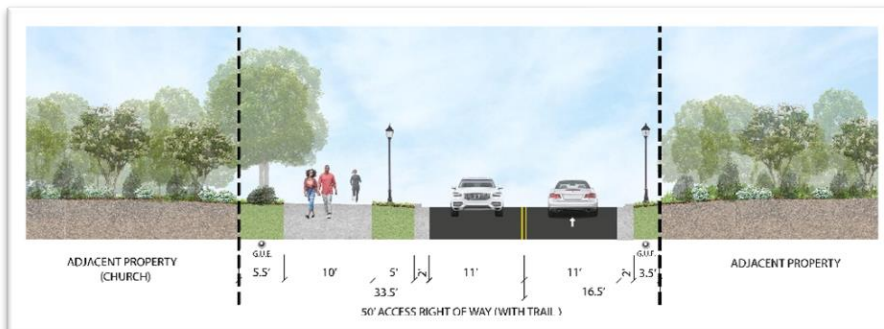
Typ. Neighborhood Road Sections (Appx. Exhibit 11.3)
